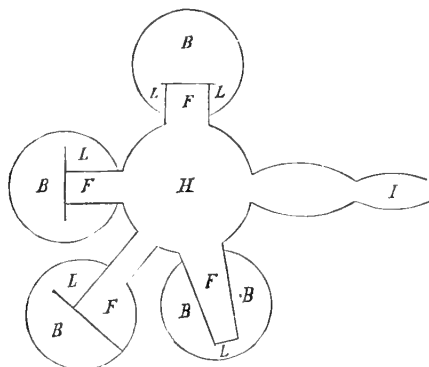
Plan of Hudson Bay house. (From Hall II, p. 128.)
